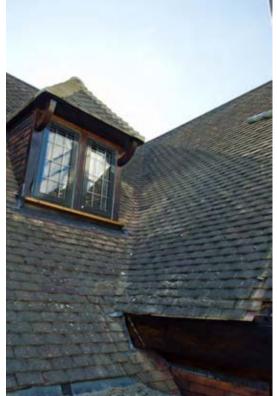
Valley and ridge tiles on roof (#BCA16-0104)
